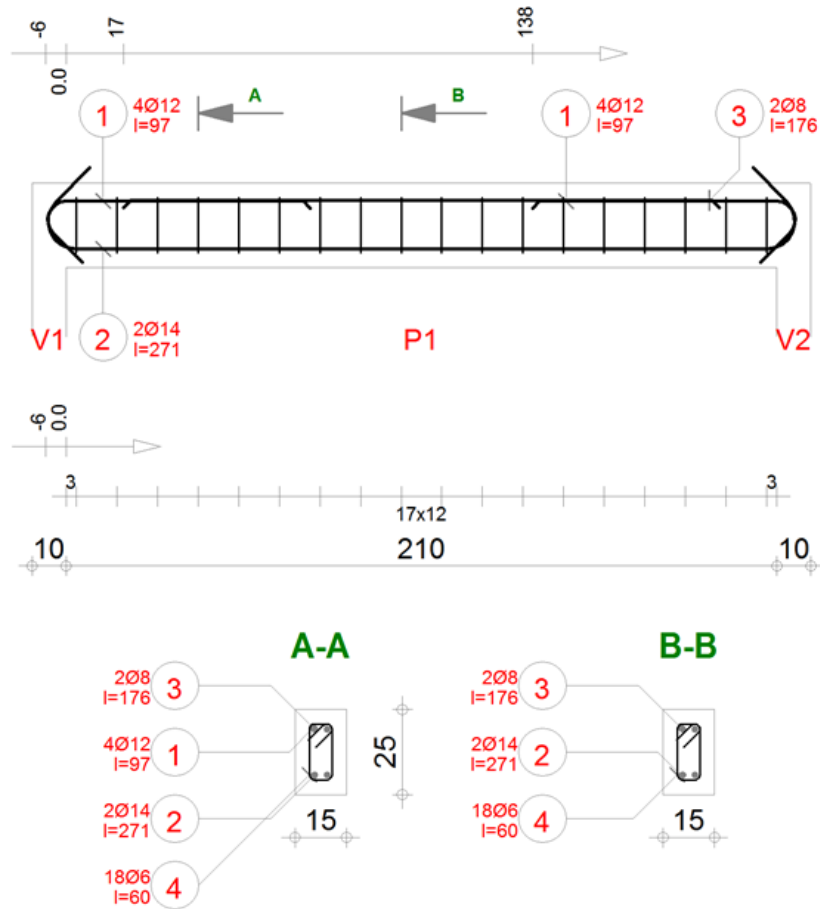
Reinforcement drawing (position, dimension, diameters) for the tested beams (tests Beam1P0, Beam2P0, Beam3PsDSS and Beam4PsDB).
